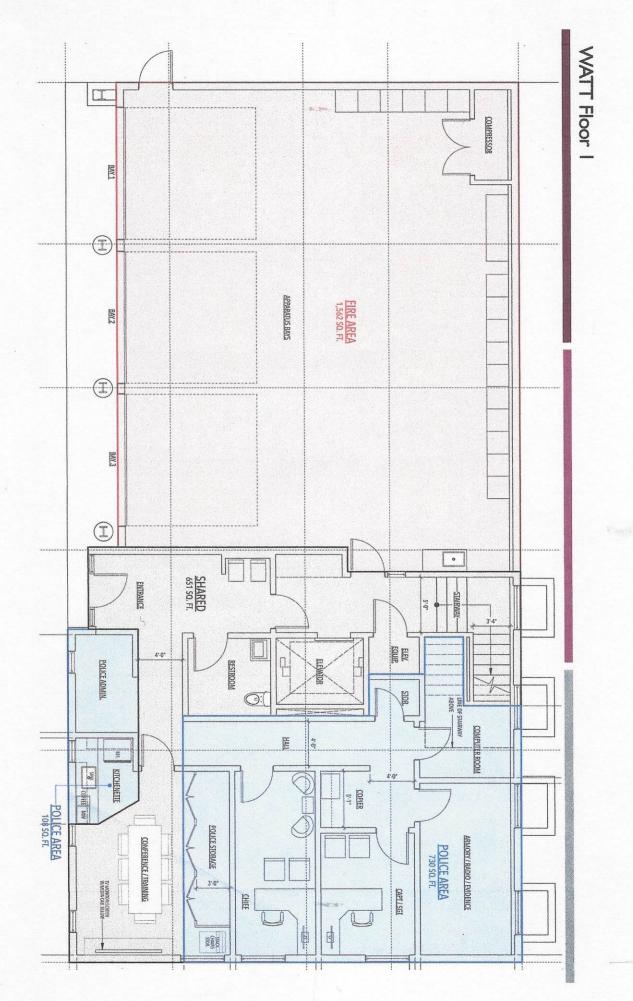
REVISED 1<sup>st</sup> FLOOR PLAN
